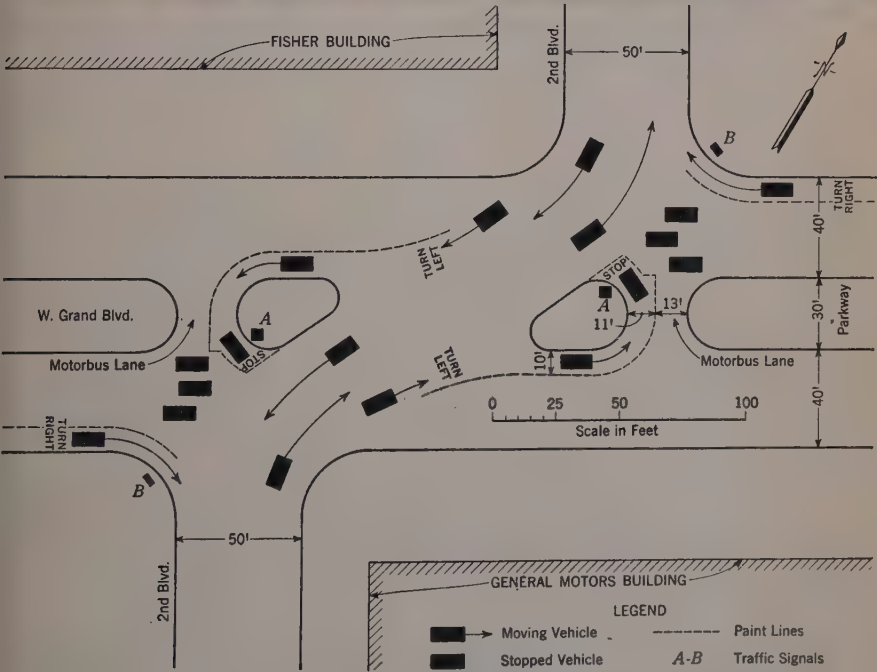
CHANNELIZATION OF TRAFFIC AT SECOND BOULEVARD AND WEST GRAND BOULEVARD, DETROIT, MICH.
